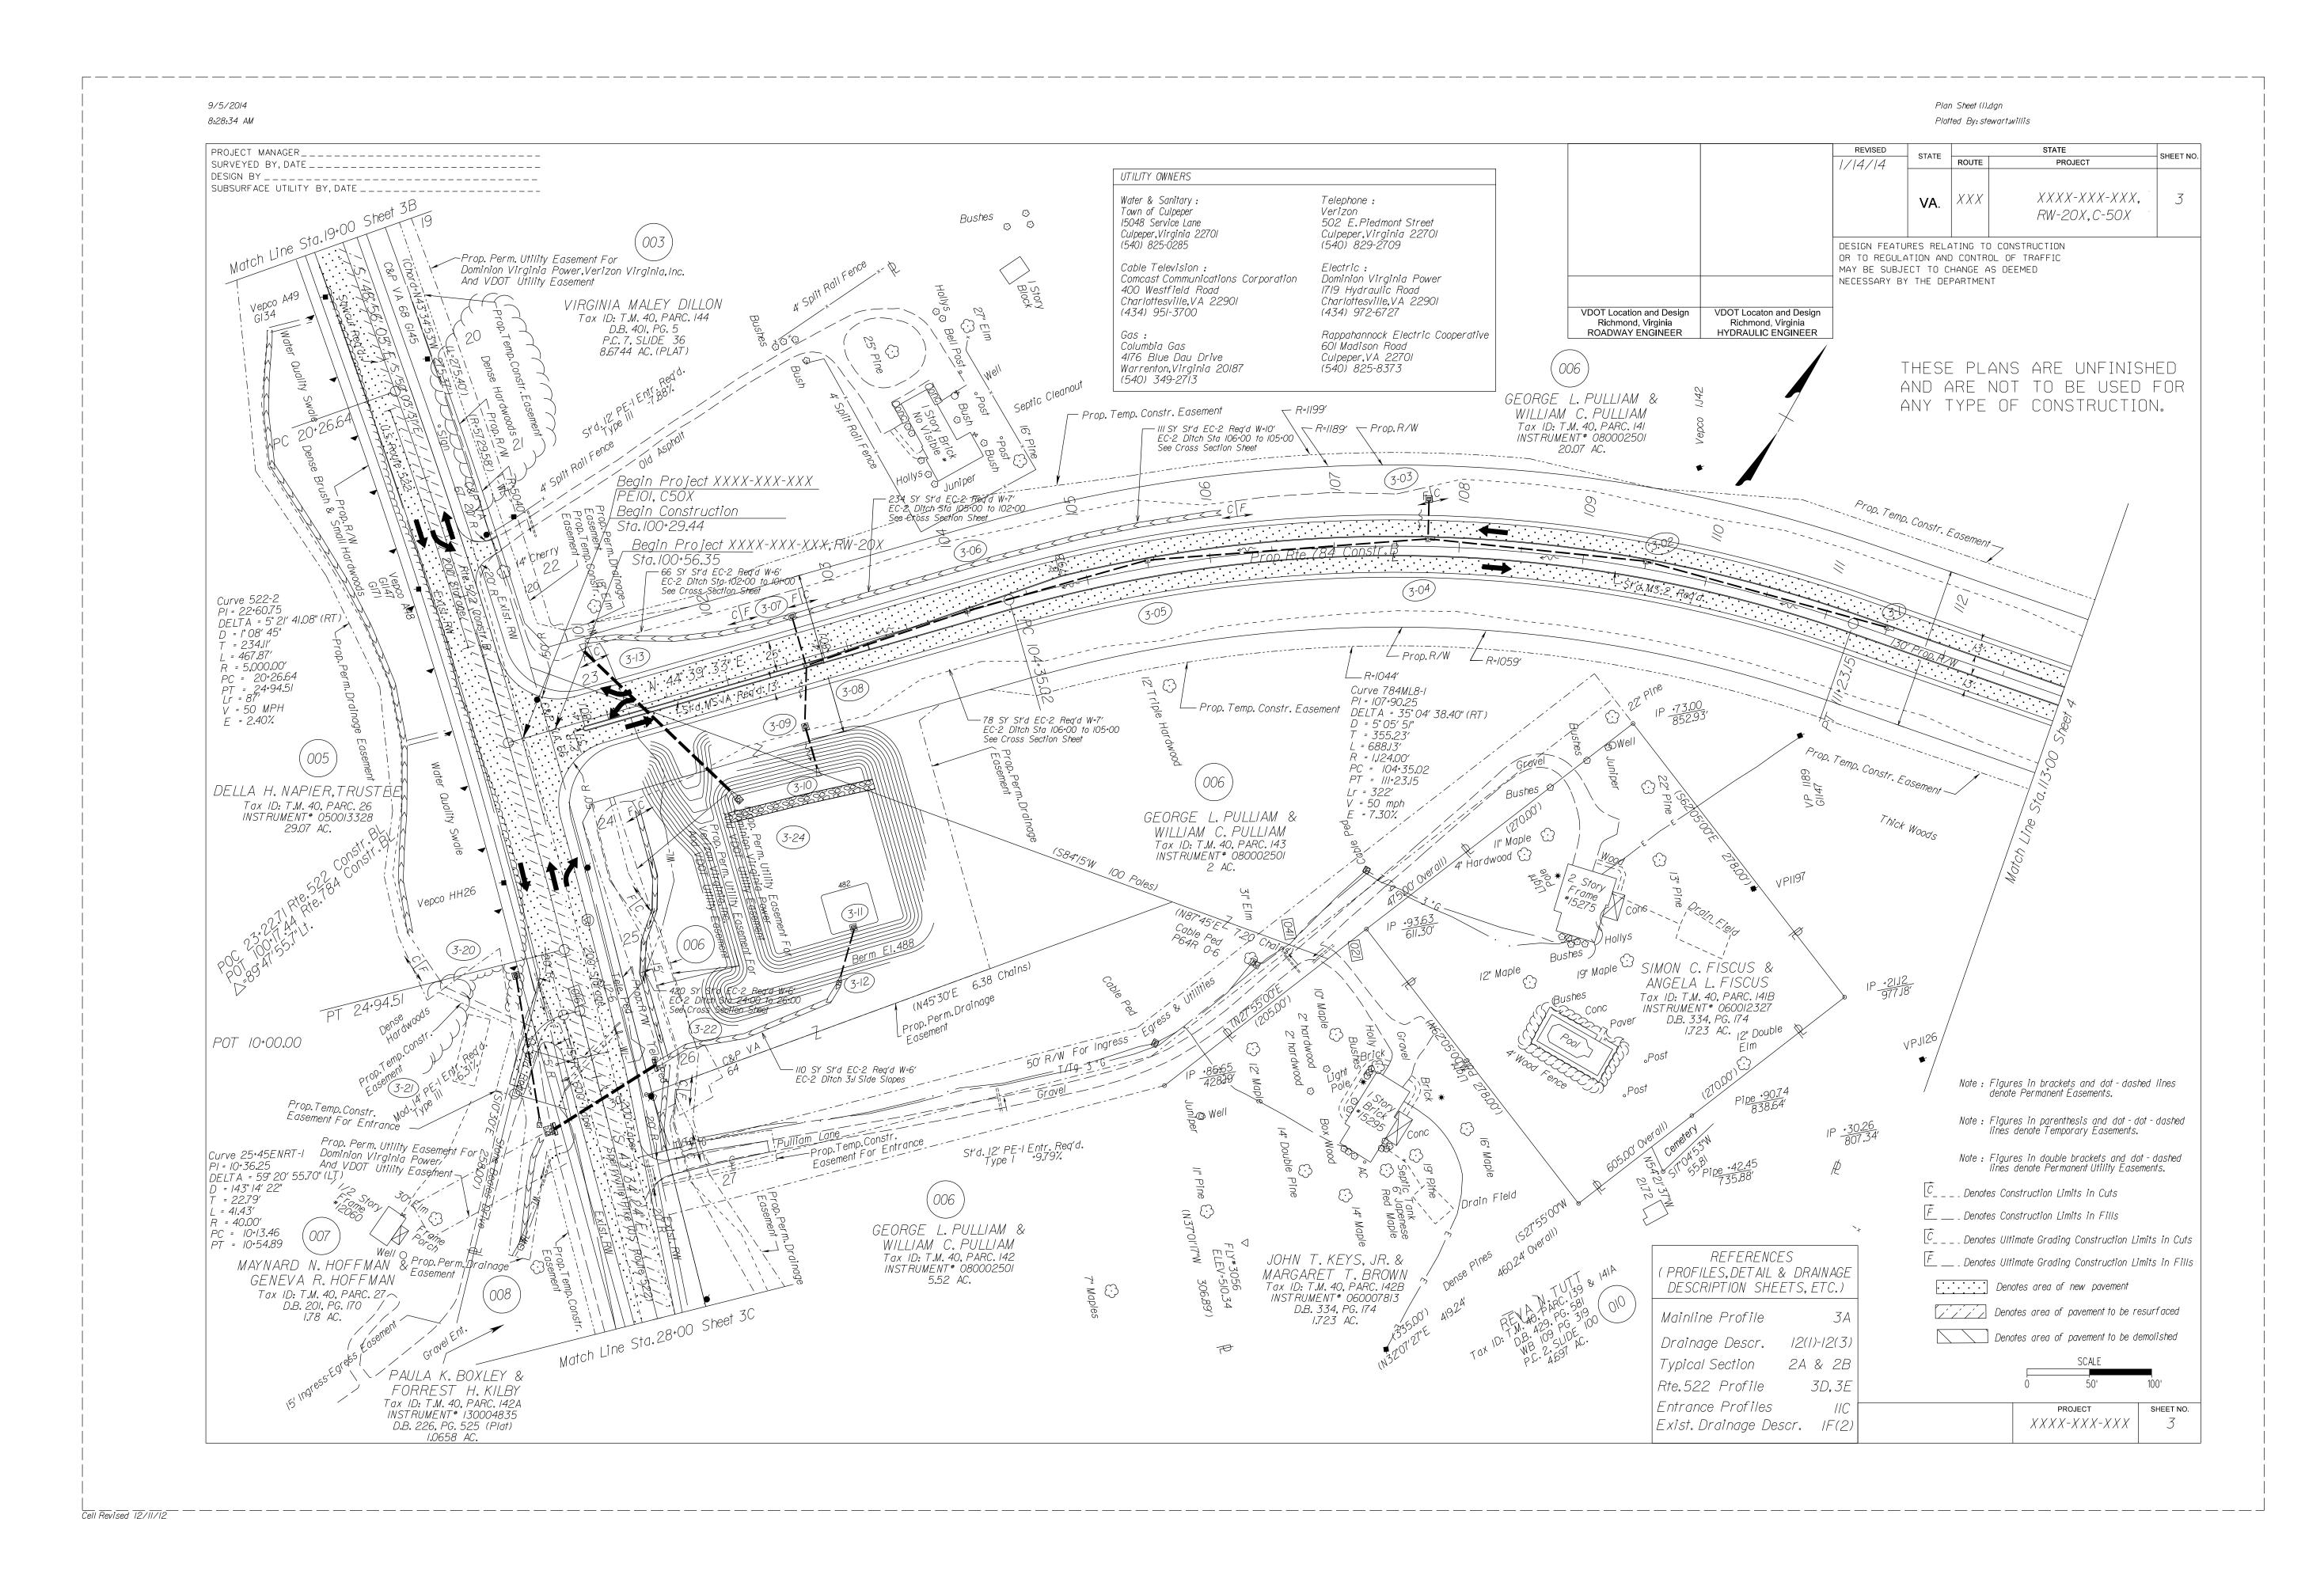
H - 31 SAMPLE 1 PLAN SHEET
